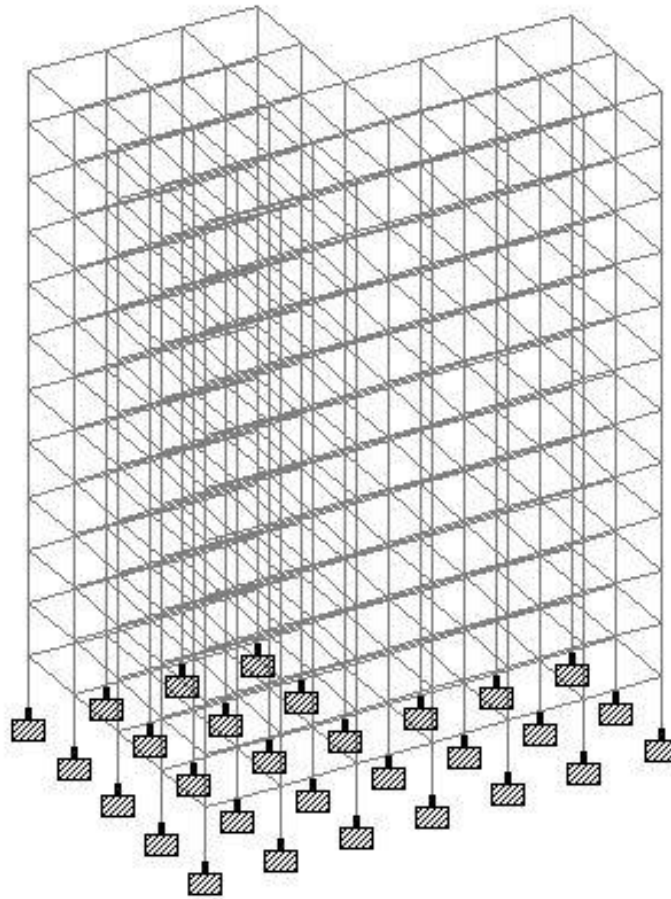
3D view of of L shaped Re-entrant corner Structure(12 Storeys)
